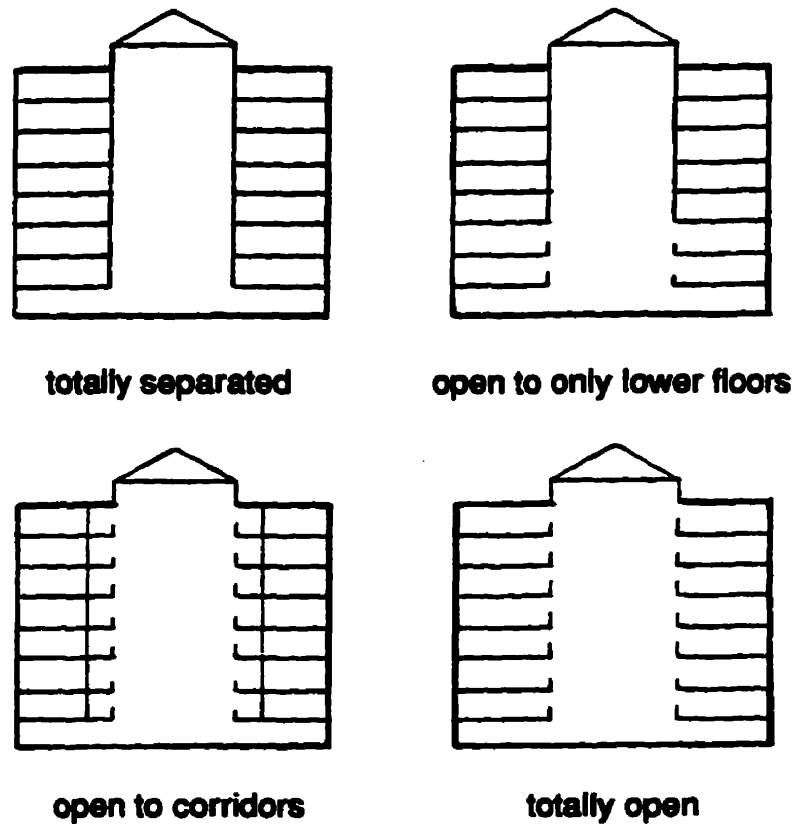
Types of atriums based on spatial connections to adjacent buildings (adapted from [14])
